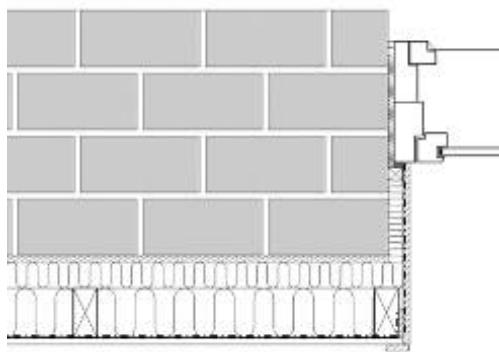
Horizontal section of the joint between the loadbearing exterior wall and the window after improved thermal insulation measures.
